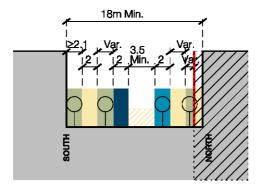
Street coding section: between Plot G and the ViBe Student Living building.
